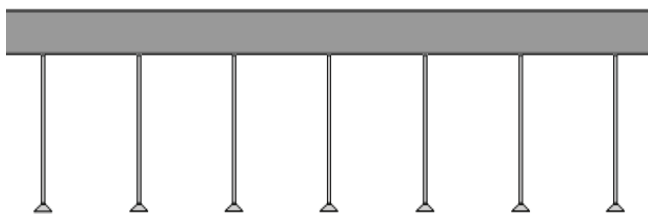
Diagram of Case 3 floor construction - Joist system floor
